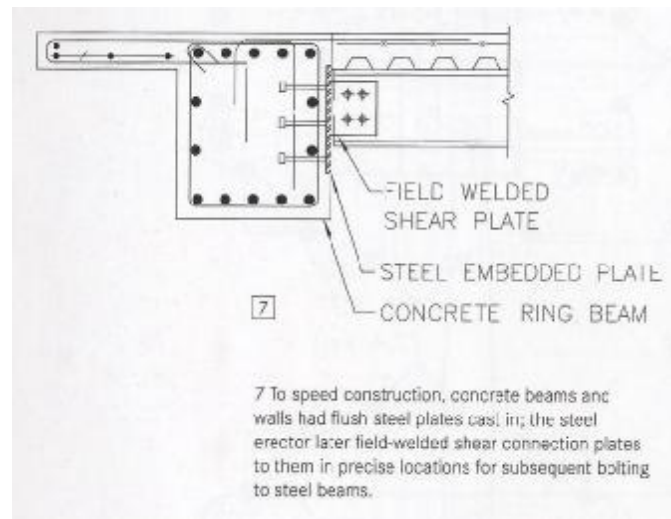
Section of plate embedded into a concrete beam for the attachment of a steel floor beam [4].
